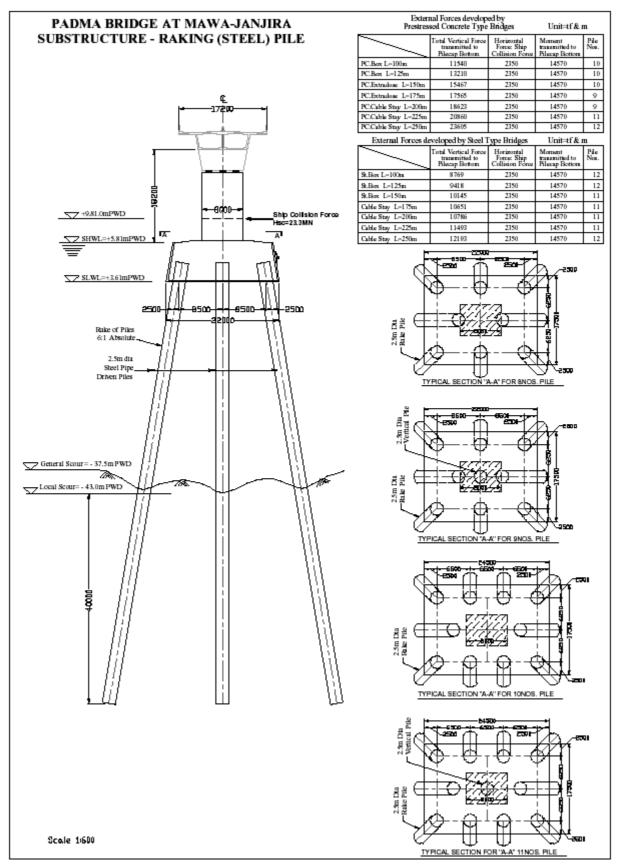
Mawa – Janjira Site, Substructure with Raking Piles
